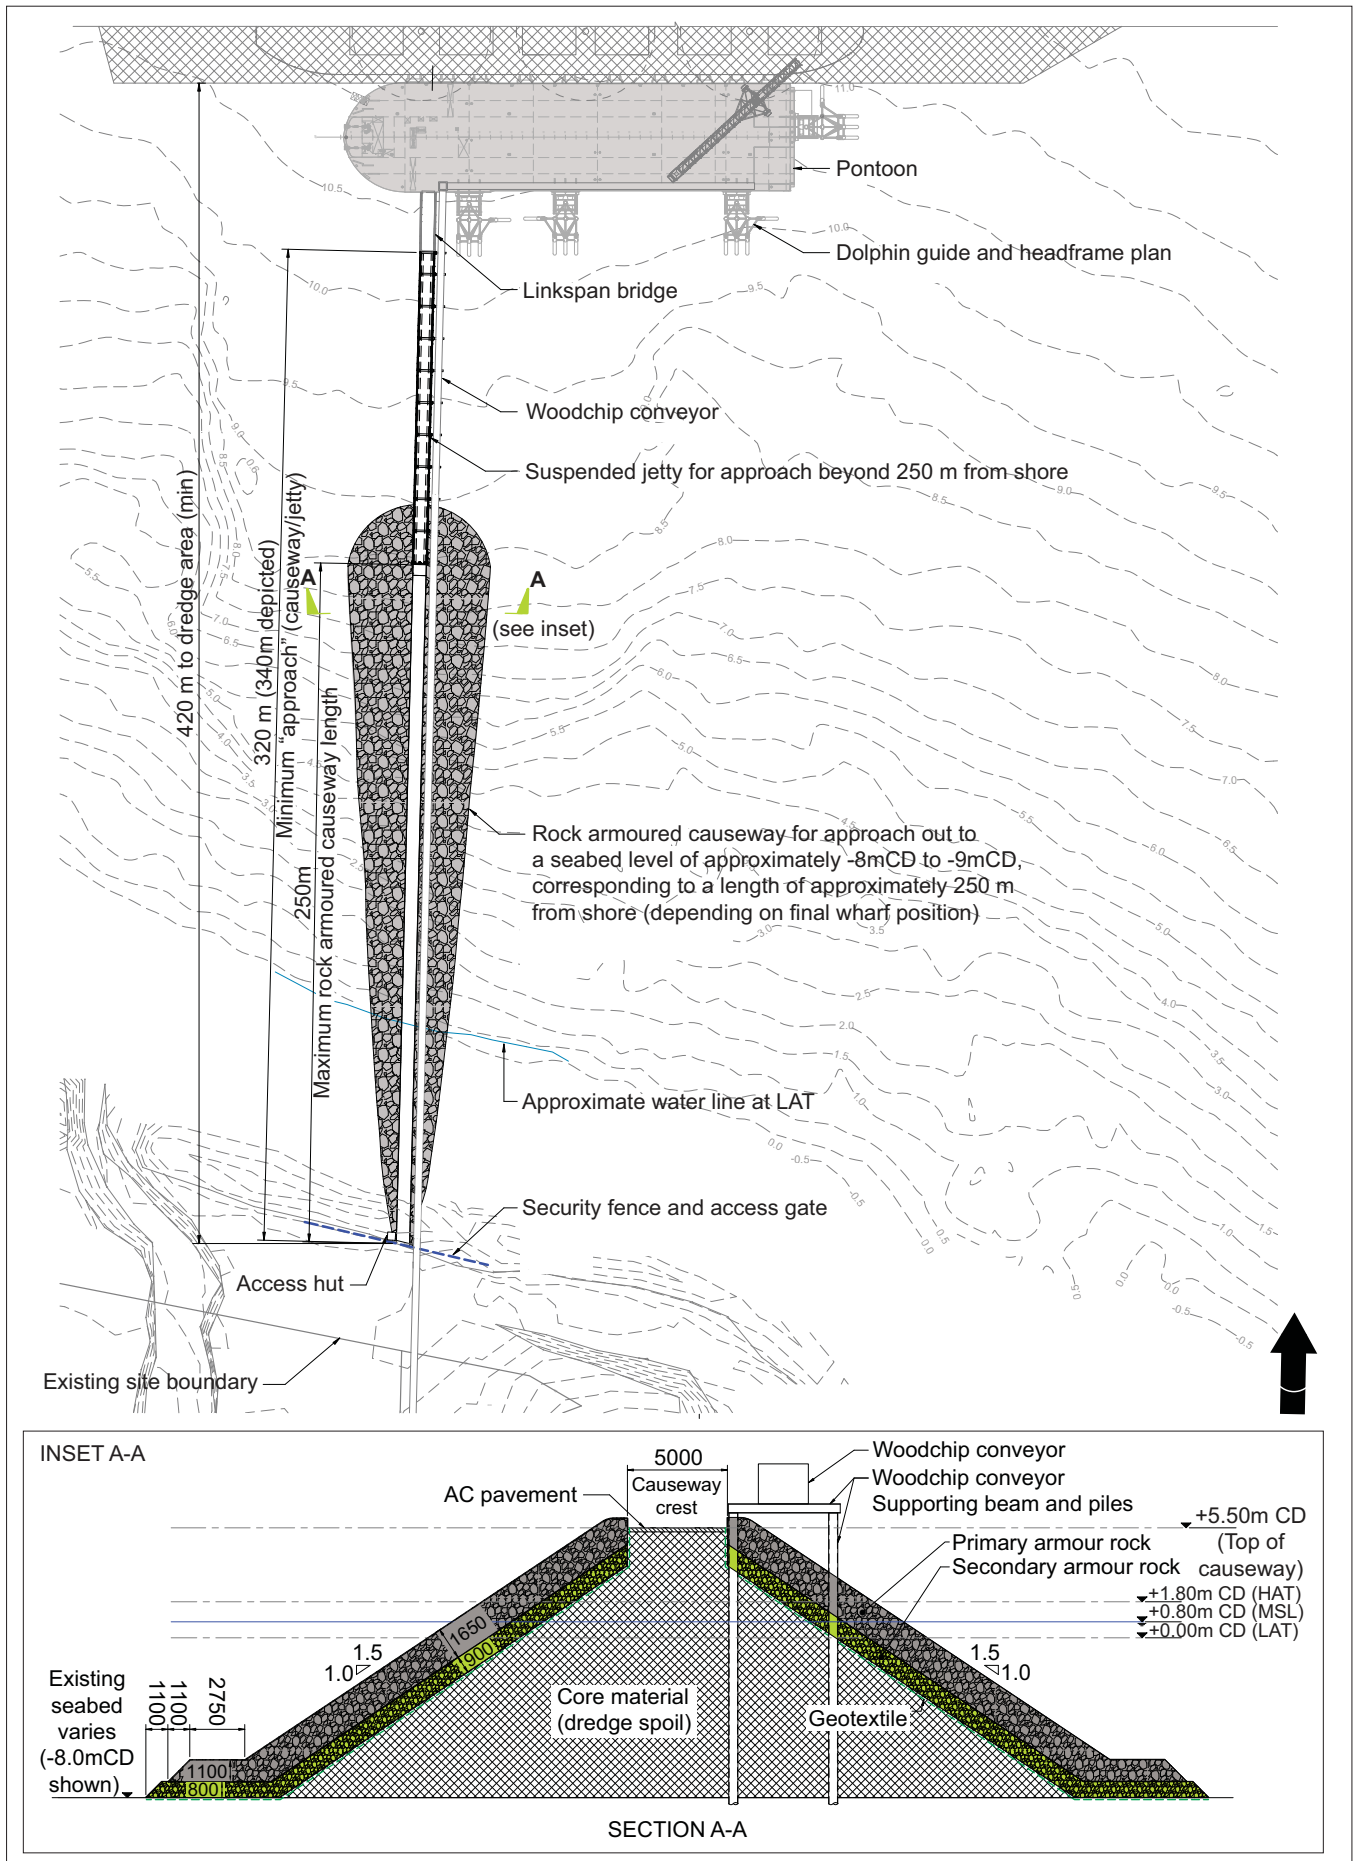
CONCEPTUAL CAUSEWAY LAYOUT AND SECTIONS
